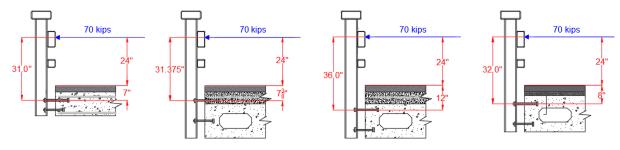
Moment Arm between Pickup Truck Design Impact Loading and Tension Anchor Rods
